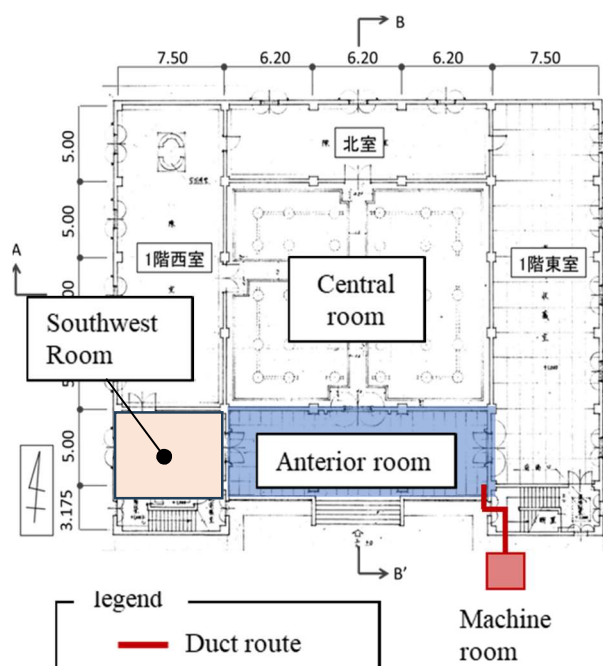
Ground floor plan of the Treasure House at Horyu-ji Temple, showing the layout of the anterior room, central storage area, and adjacent machine room
